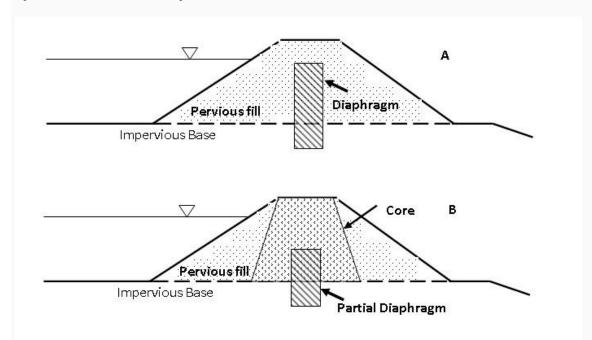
Different Diaphragm typed earthen embankment/dam.
